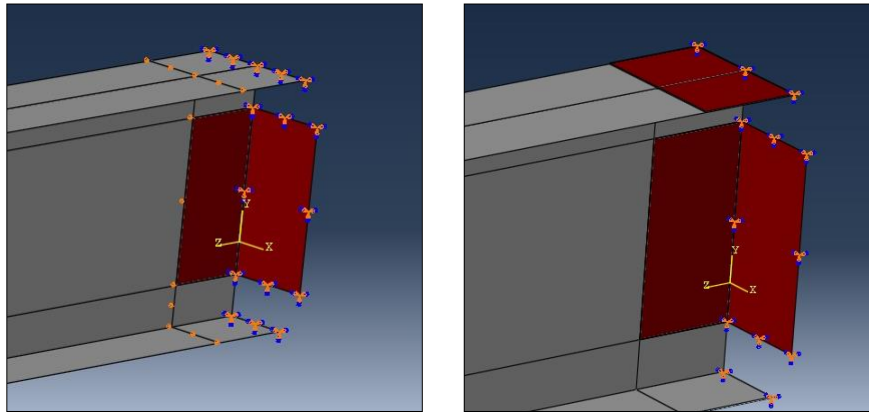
Applying Boundary condition to the welded and bolted moment connection beams
